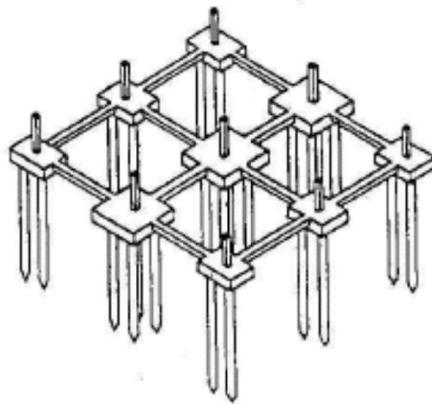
Schema of deep foundation with prefabricated piles.
